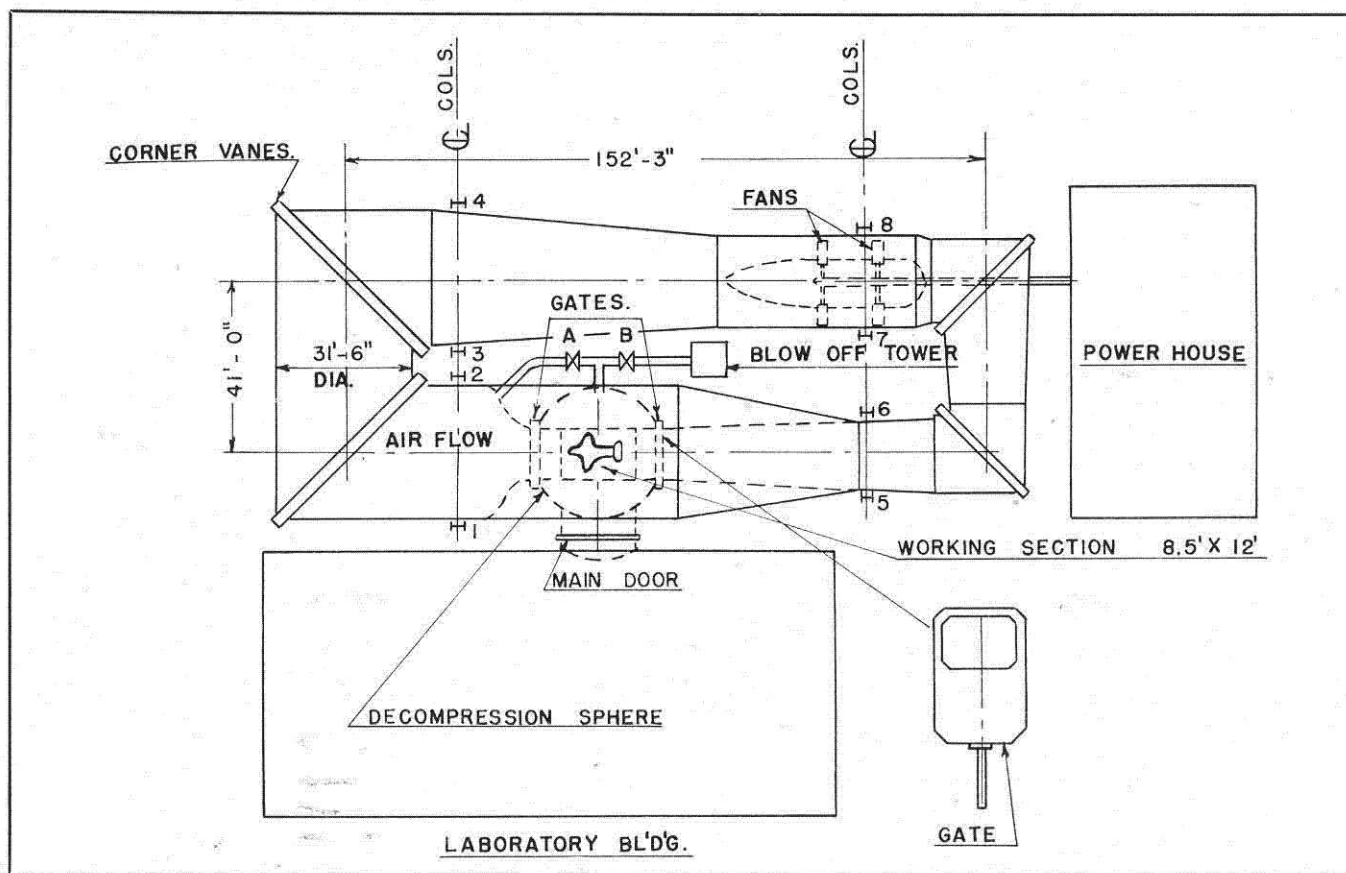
Diagrammatic plan view of tunnel, showing supporting columns.
